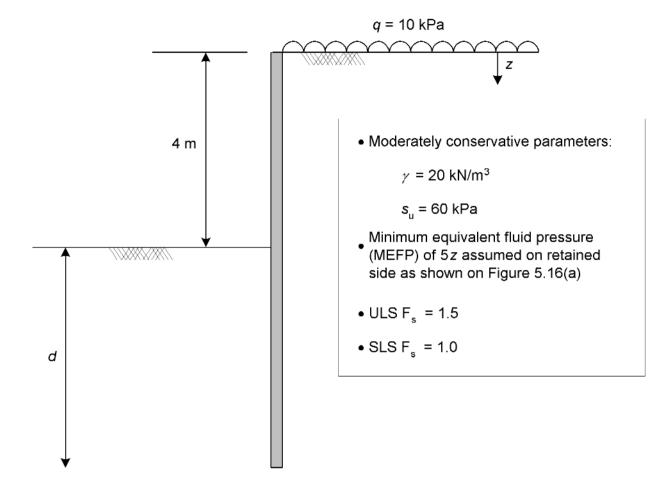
Example 3 - cantilever wall: total stress analysis
